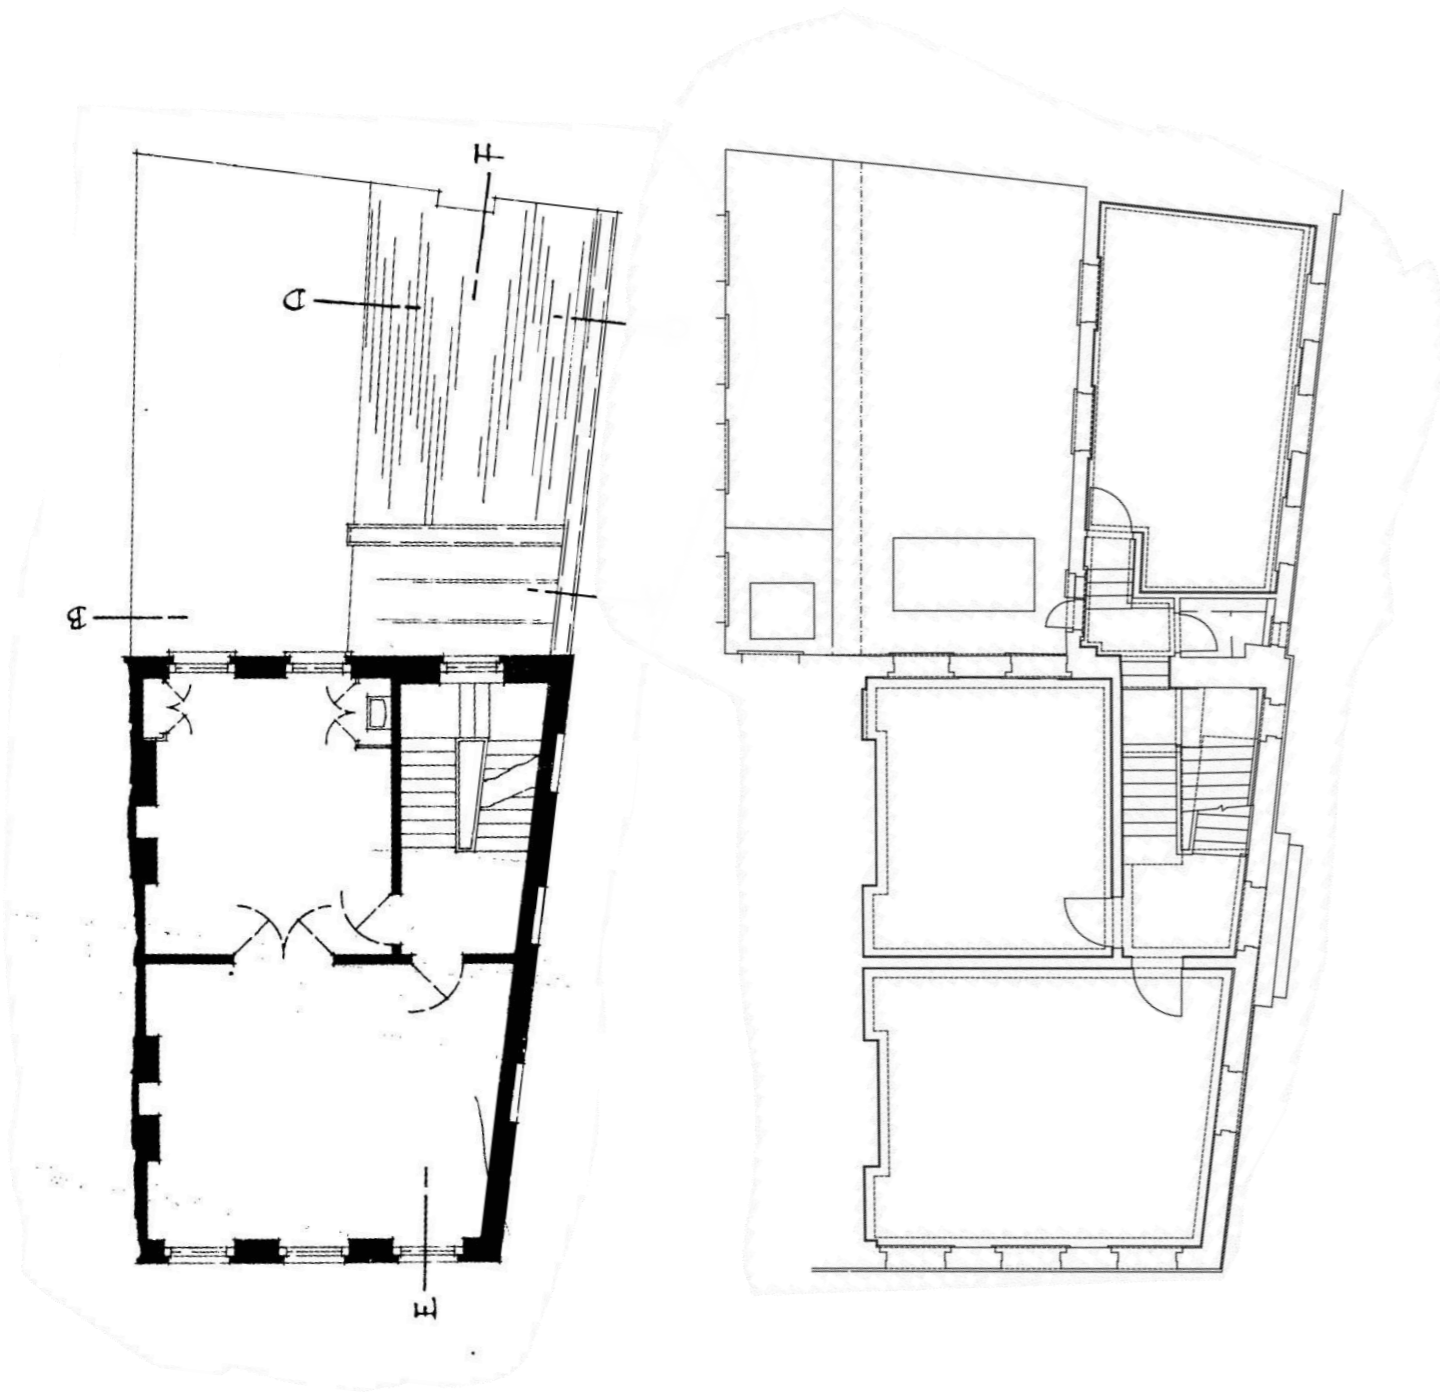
First Floor, 1939 plan (left) and existing plan (right).
